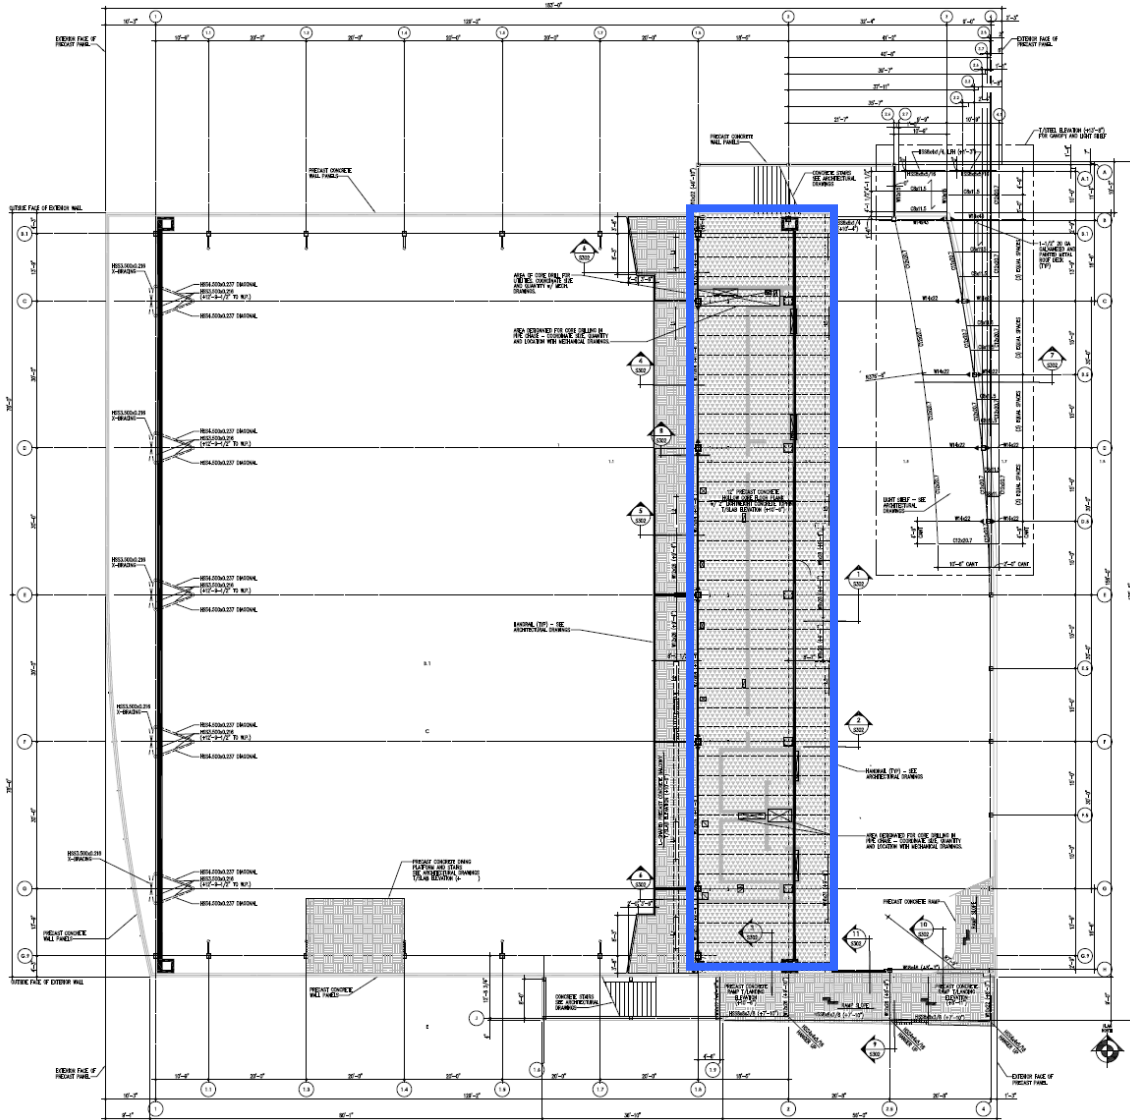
Concourse Level Framing Plan (12" precast concrete hollow core floor planks are shown in blue – they span 27'-0" and run almost the entire length of the building)
